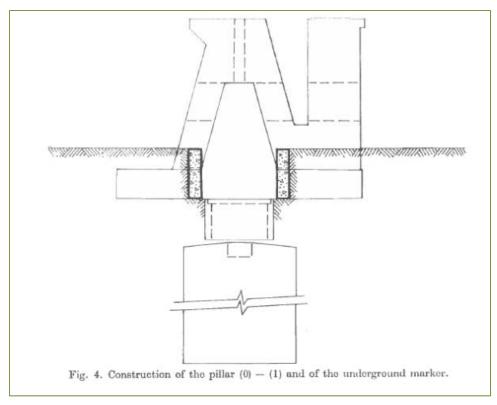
Construction detail drawing of 0-m and 1-m pillar (Kukkamäki 1968:19)
